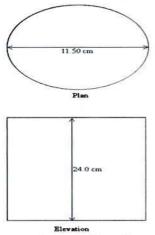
Plan & Elevation of Textile Cylinders
